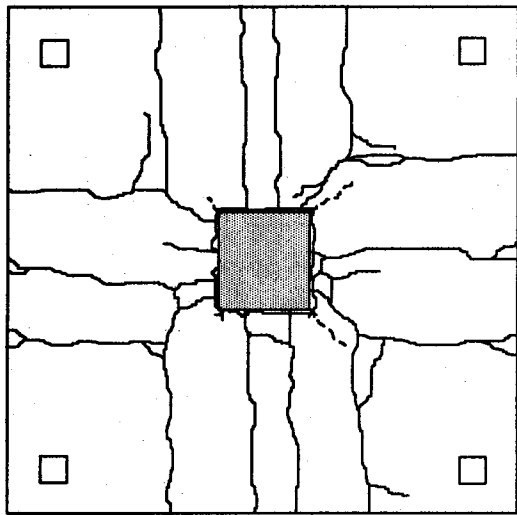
Test of Interior Sandwich Plate with Loaded Slab ($h/c=0.6$)
